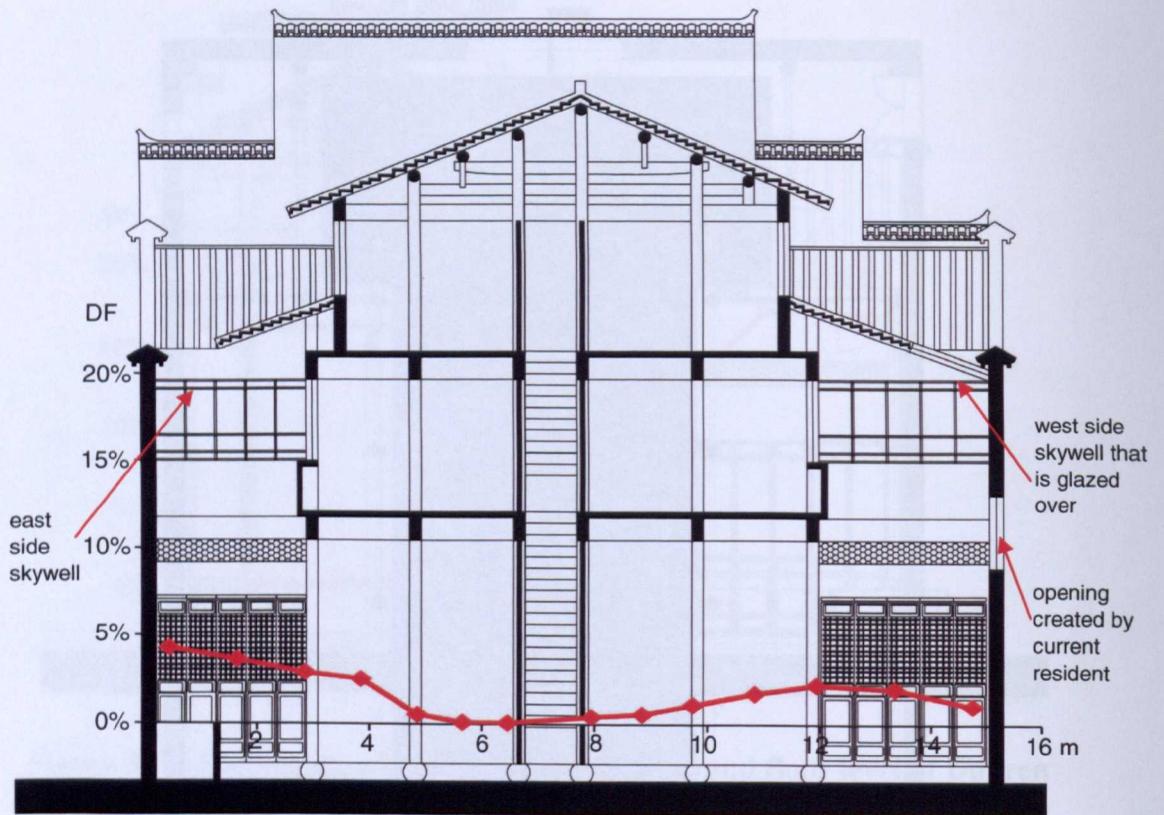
Section showing DF at 1m above ground floor level of Dunren dwelling
